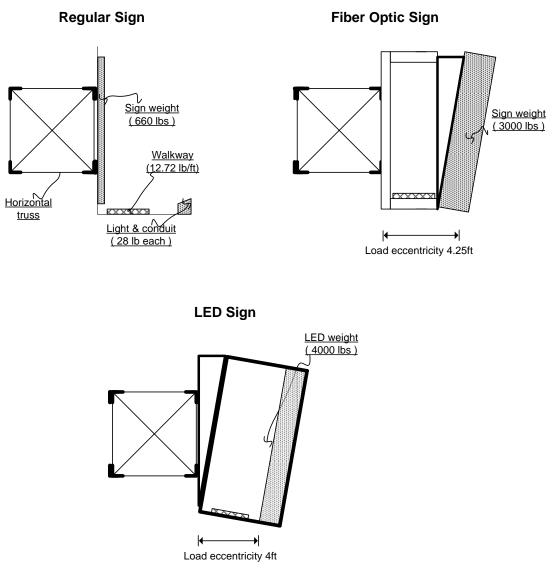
Schematic View of Signs Mounted on the Base Truss
